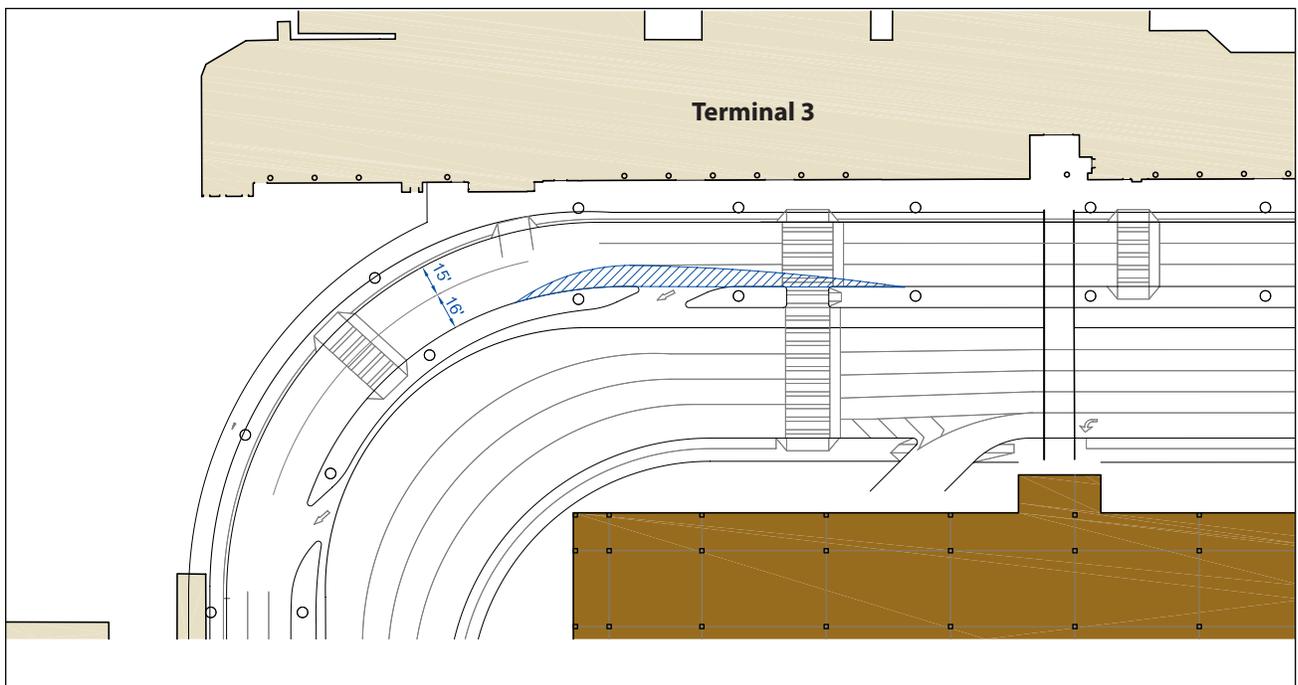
Proposed striping plan for Arrivals level inner roadway (3-lane configuration) between T3 and TBIT
